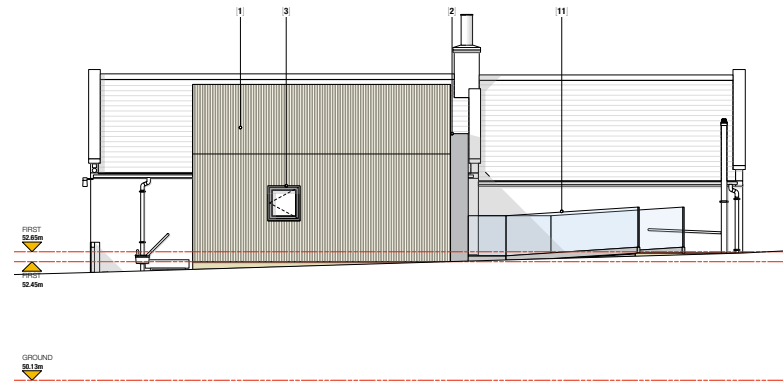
Extract from PL_003, not to scale, showing the proposed north-west (rear) elevation.
